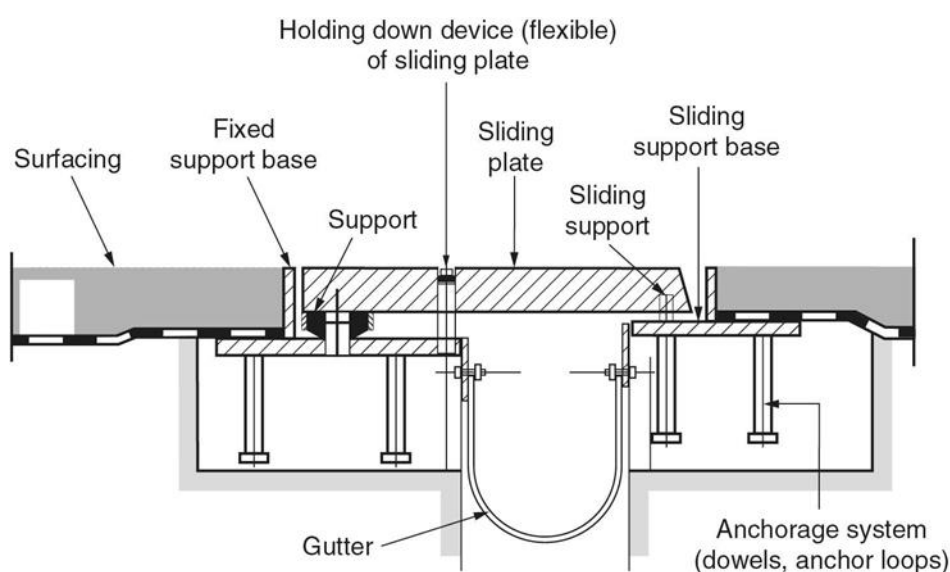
Example of supported expansion joint without fingers (Source [Ref 1.I])
